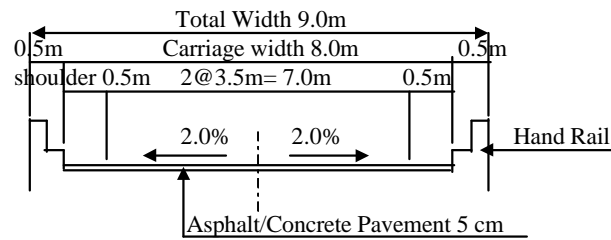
Proposed Standard Cross Section of Bridge
